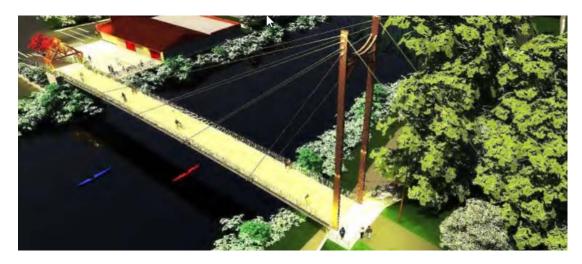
Previous Proposed Bridge (by Outlook Land Design)
